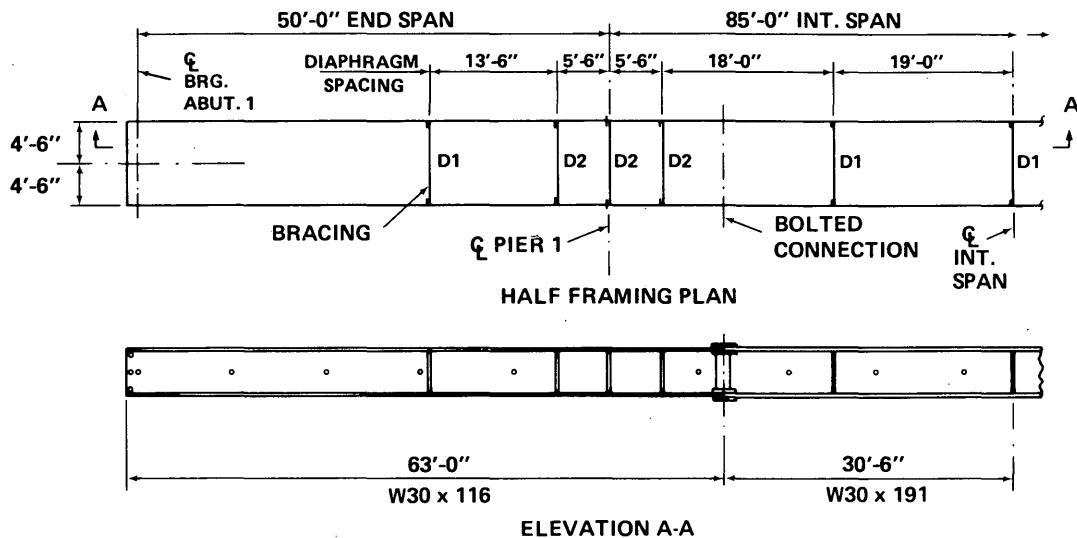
Framing plan and beam elevation of Whitechuck River Bridge (shear connectors not shown).
